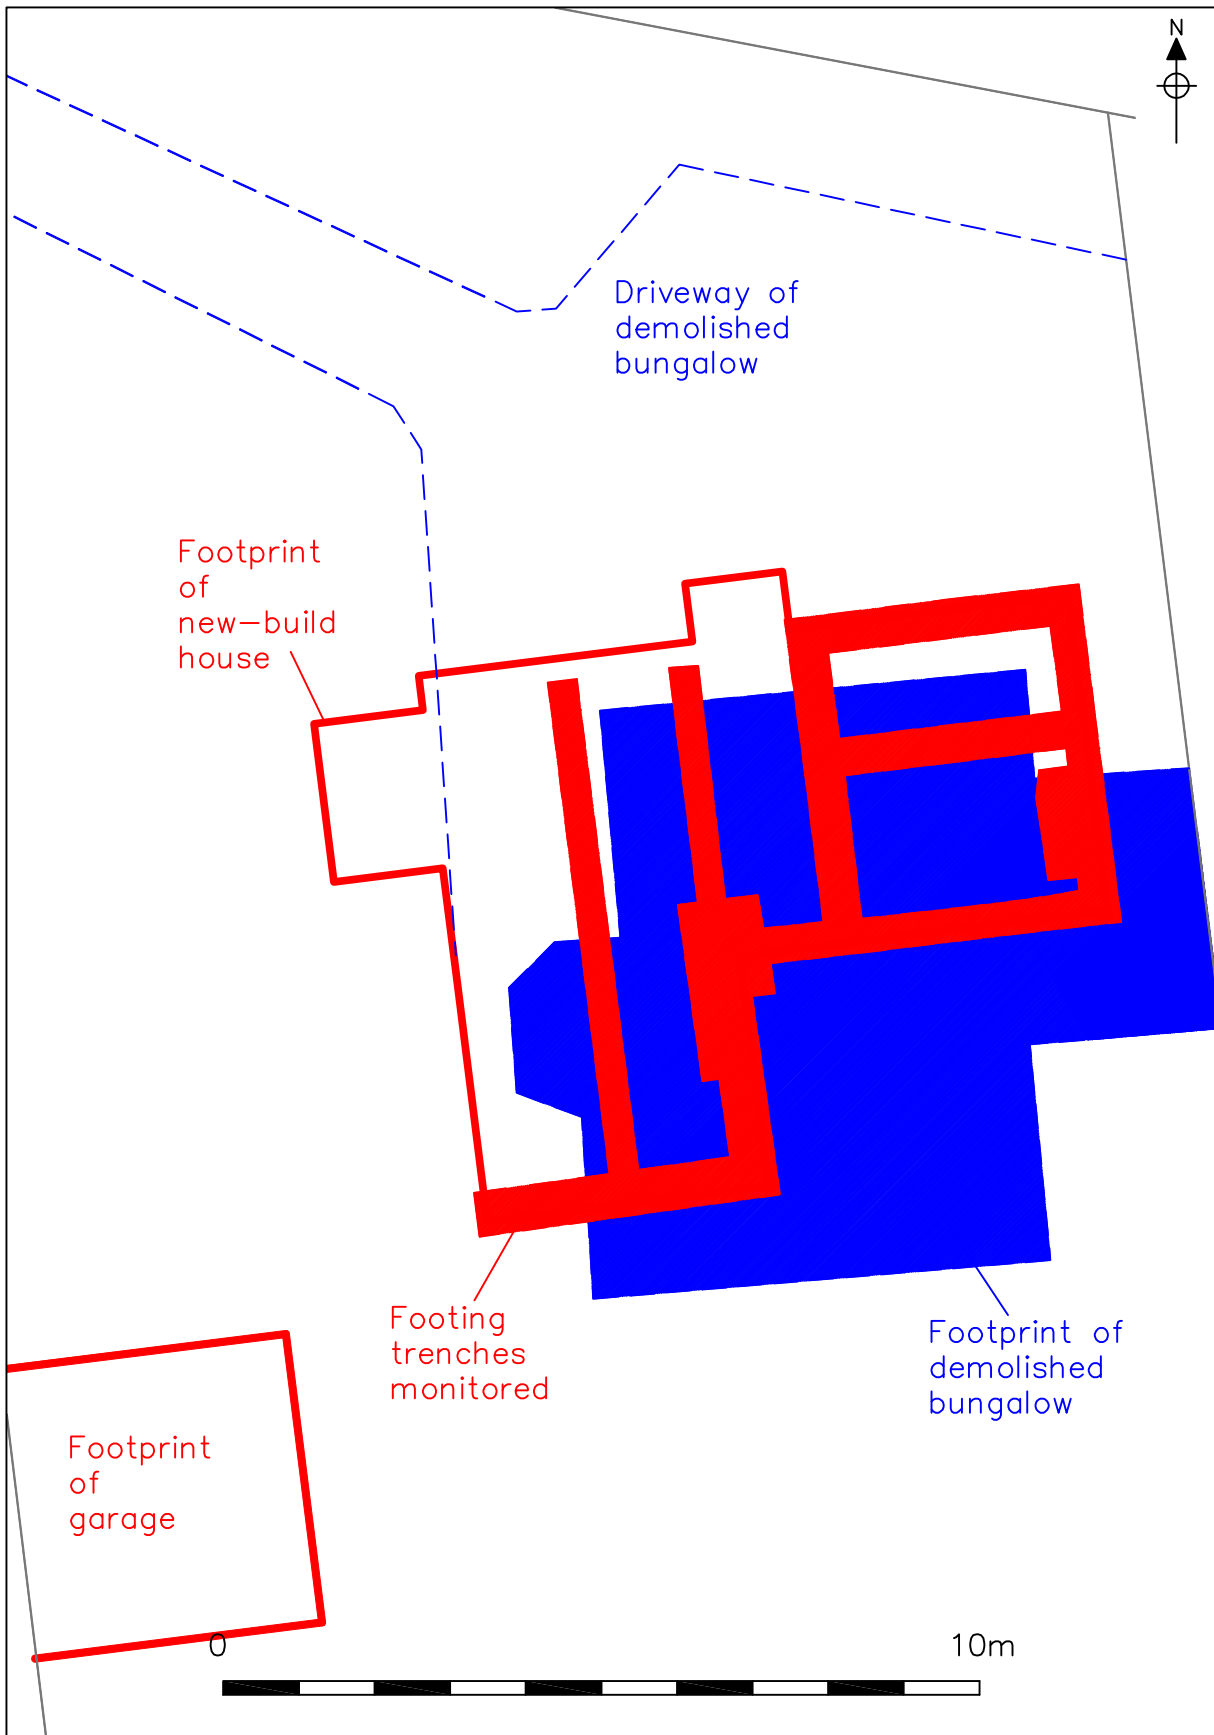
Showing monitored trenches and site layout. Scale 1:200
